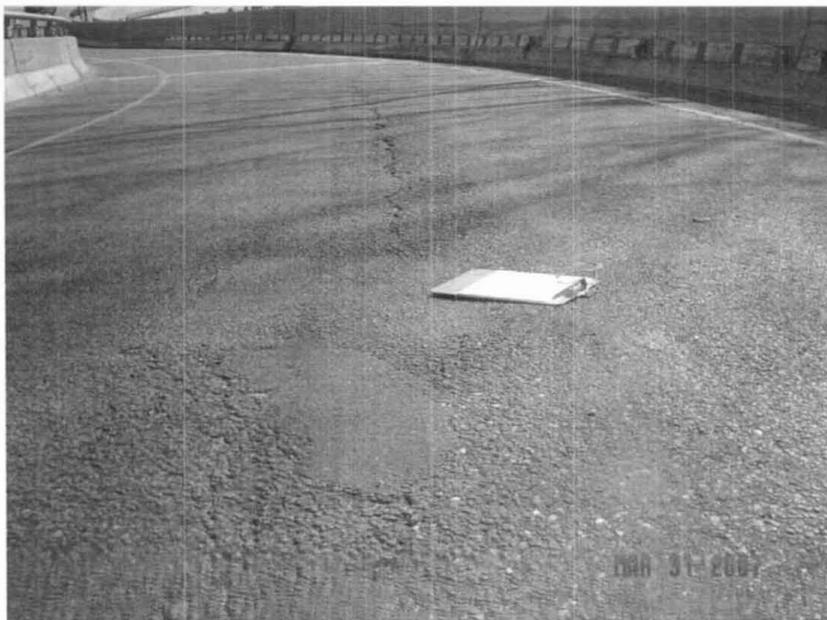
Uneven overlay and a 1" wide crack with raveling bituminous in span 3.
